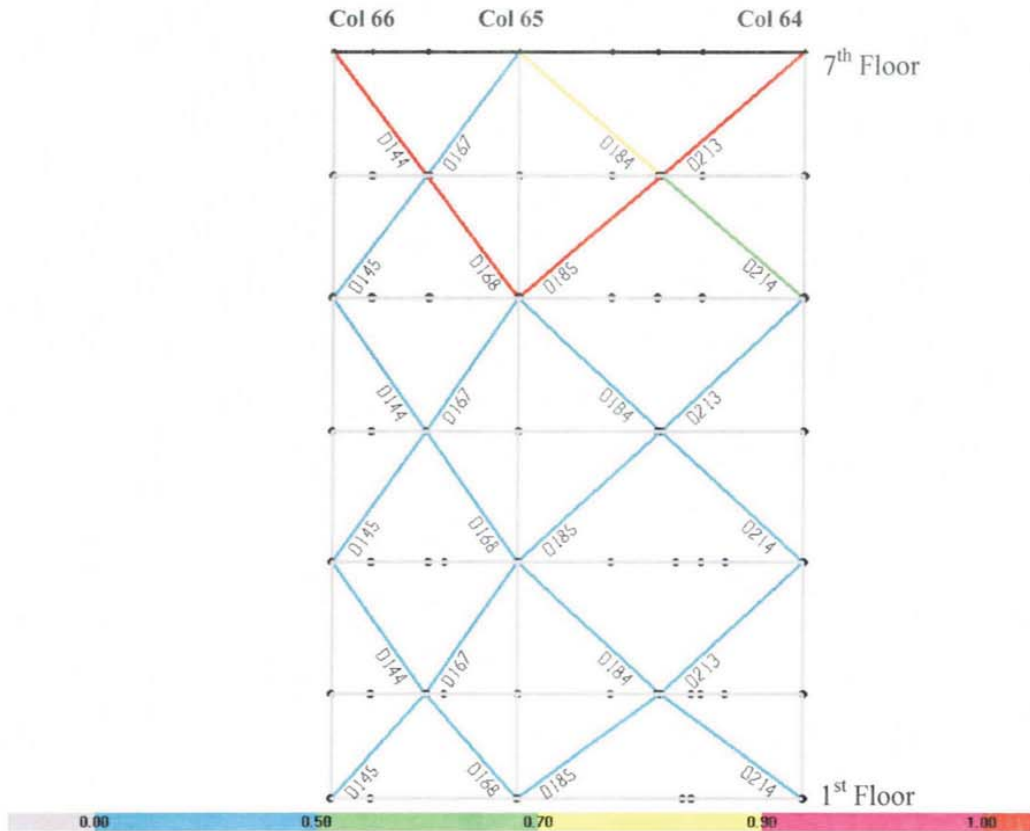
East to West Core Brace (Column 66-65-64) Diagram
